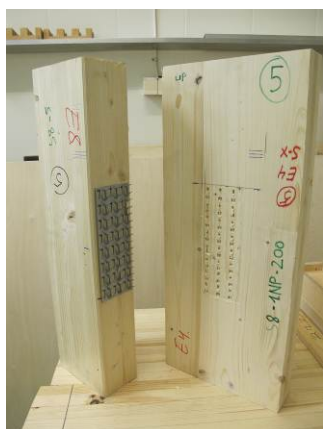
Specimen with double-sided nail plate 200 mm after failure
